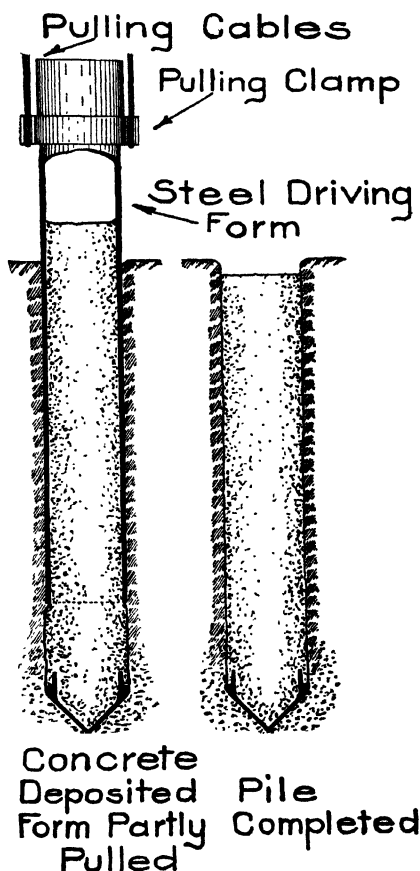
Method of Forming Concrete Piles in Place. (See p. 685.)
